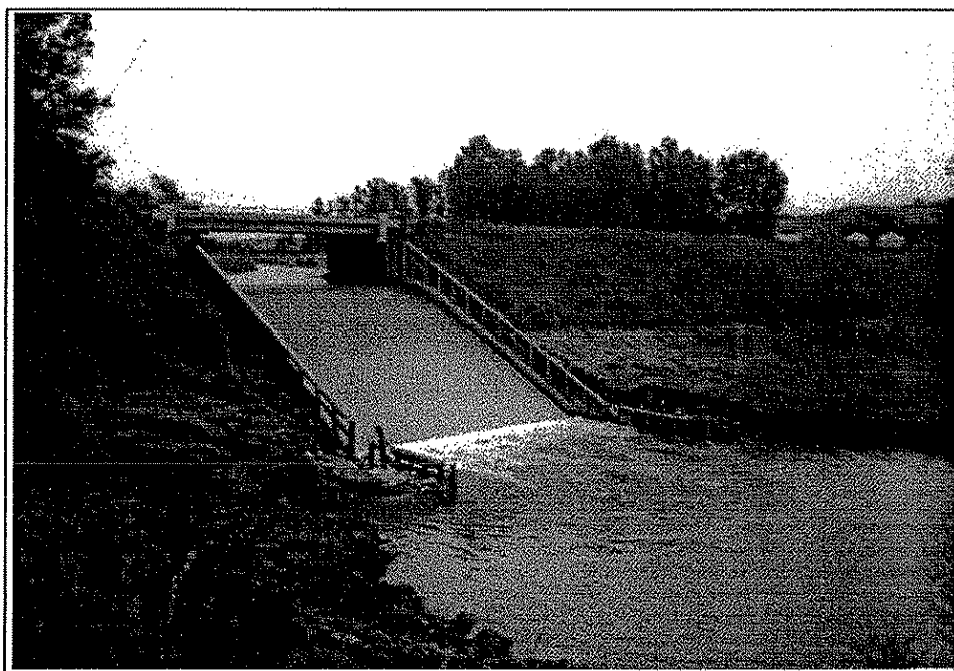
Reinforced concrete "Greenwood" flume, Willow Creek L16 bridge, Harrison County.
